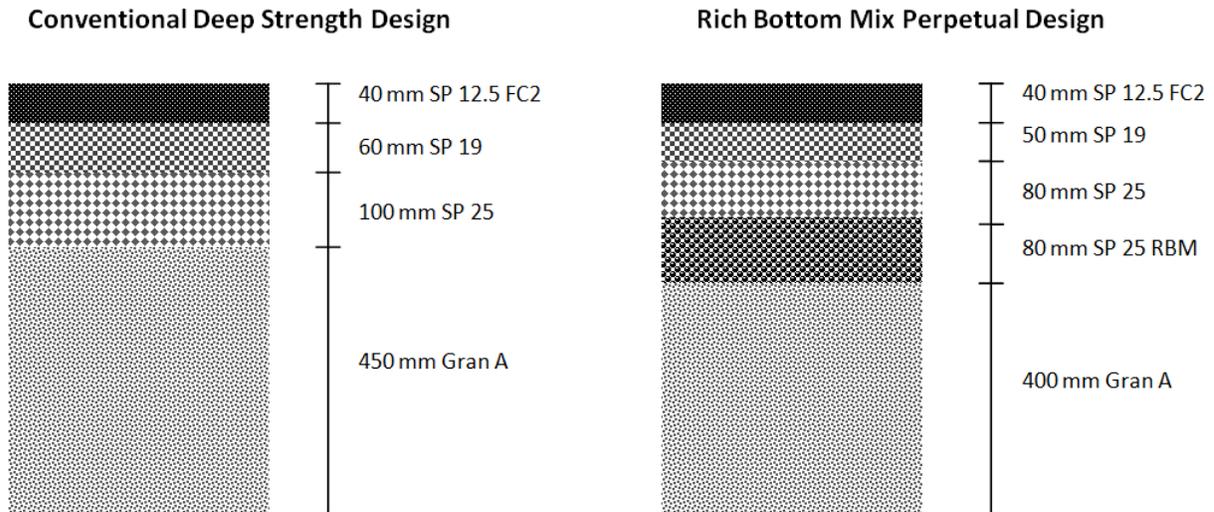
Highway 406 Conventional and Perpetual Pavement Design
